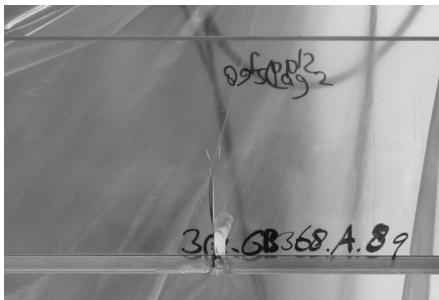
Typical model level II damage in 3re.SG.A specimen.
